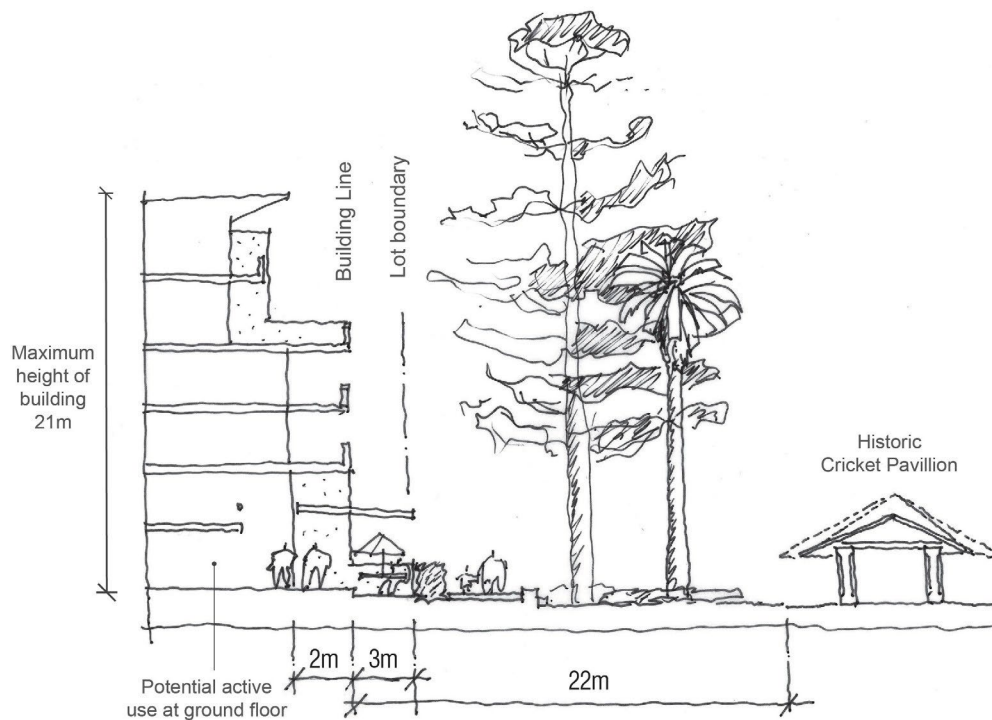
Lot F3 and Open Space 3 Section
